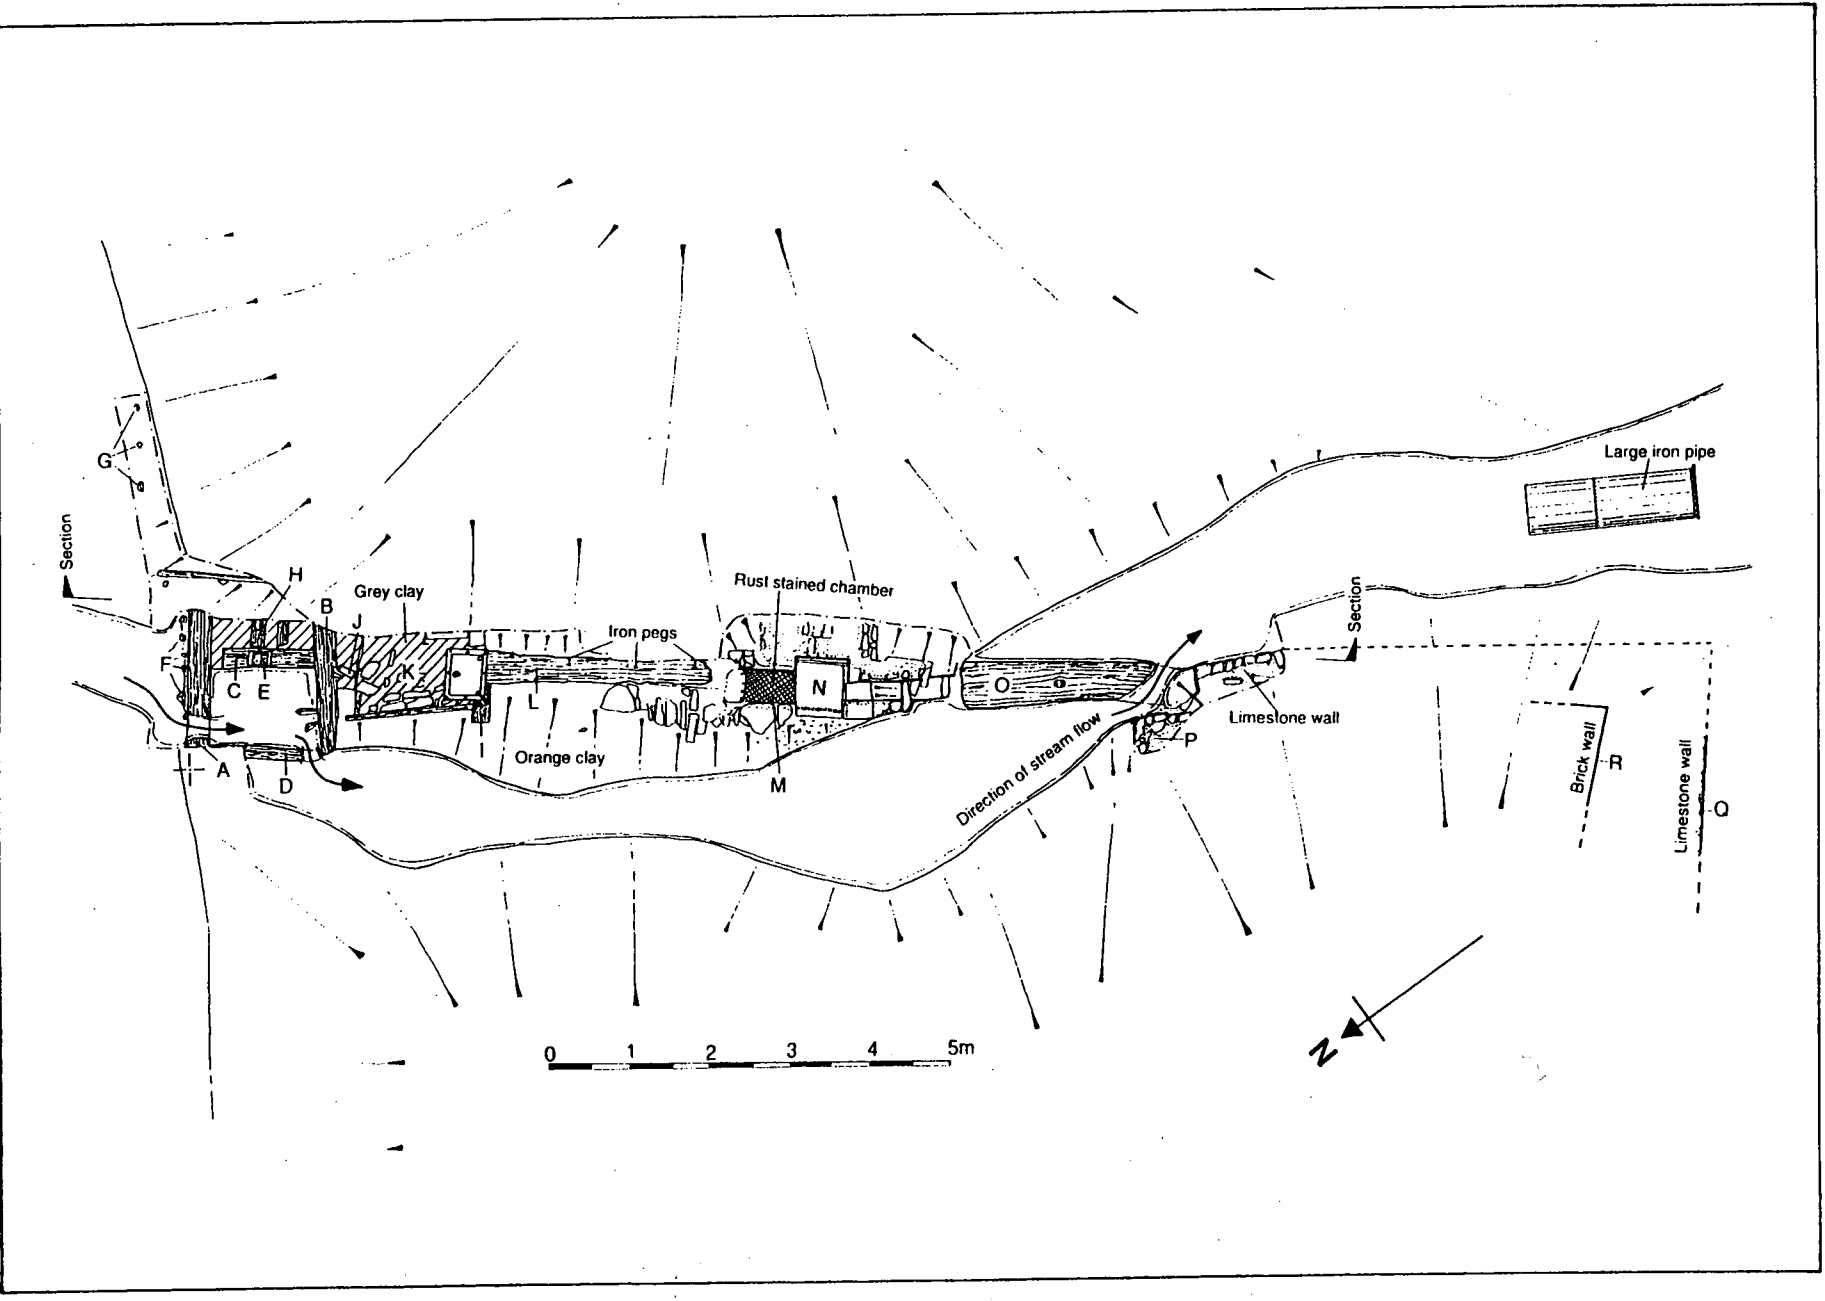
Stowe Gardens. Plan of the timbers and sluice revealed in the construction of the Haymanger Pond Dam.
